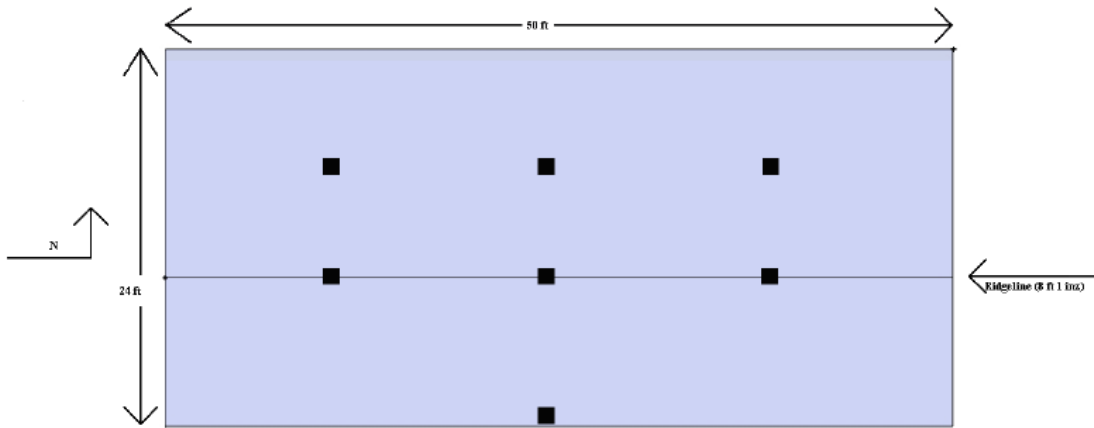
Plan of the Corn Crib (TCI 2015: 137)
